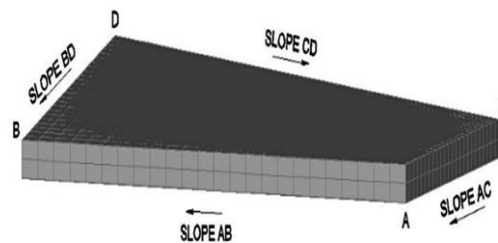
Schematic of non-planar pavement surface where opposite sides always have different Slopes.
